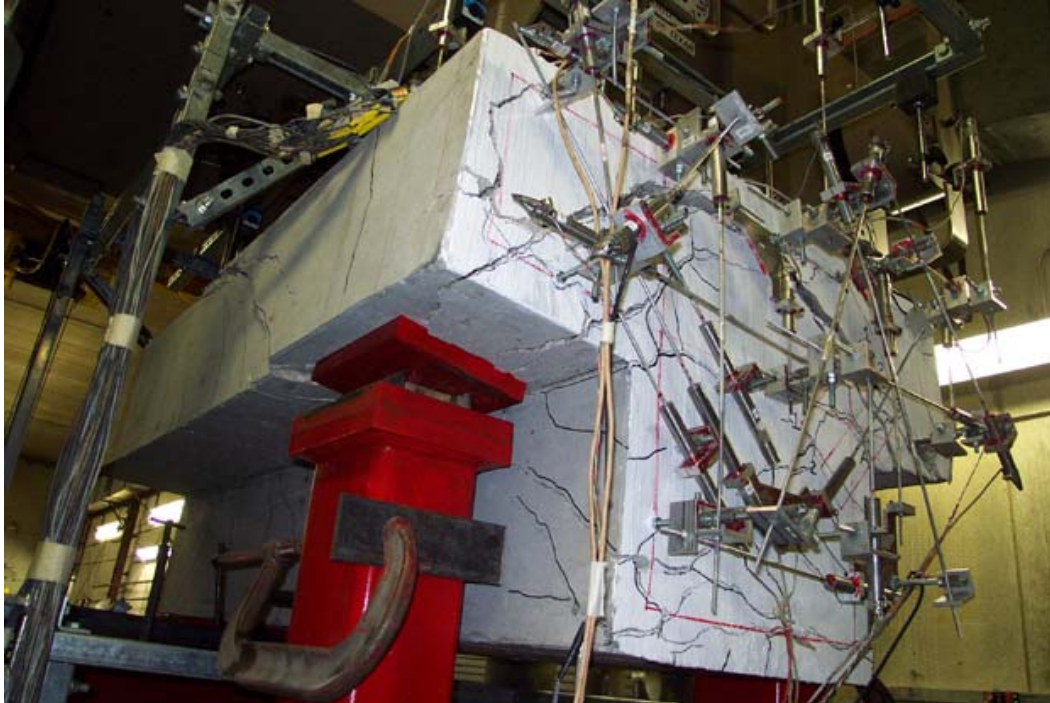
(b) Punching shear failure in Specimen E-0-12
